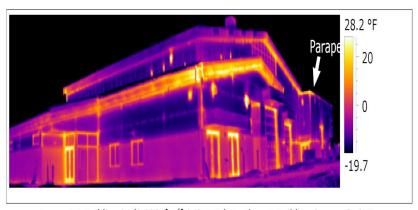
Building 31 (0.328cfm/ft2 @75Pa) Northwest Building Corner @+25Pa
